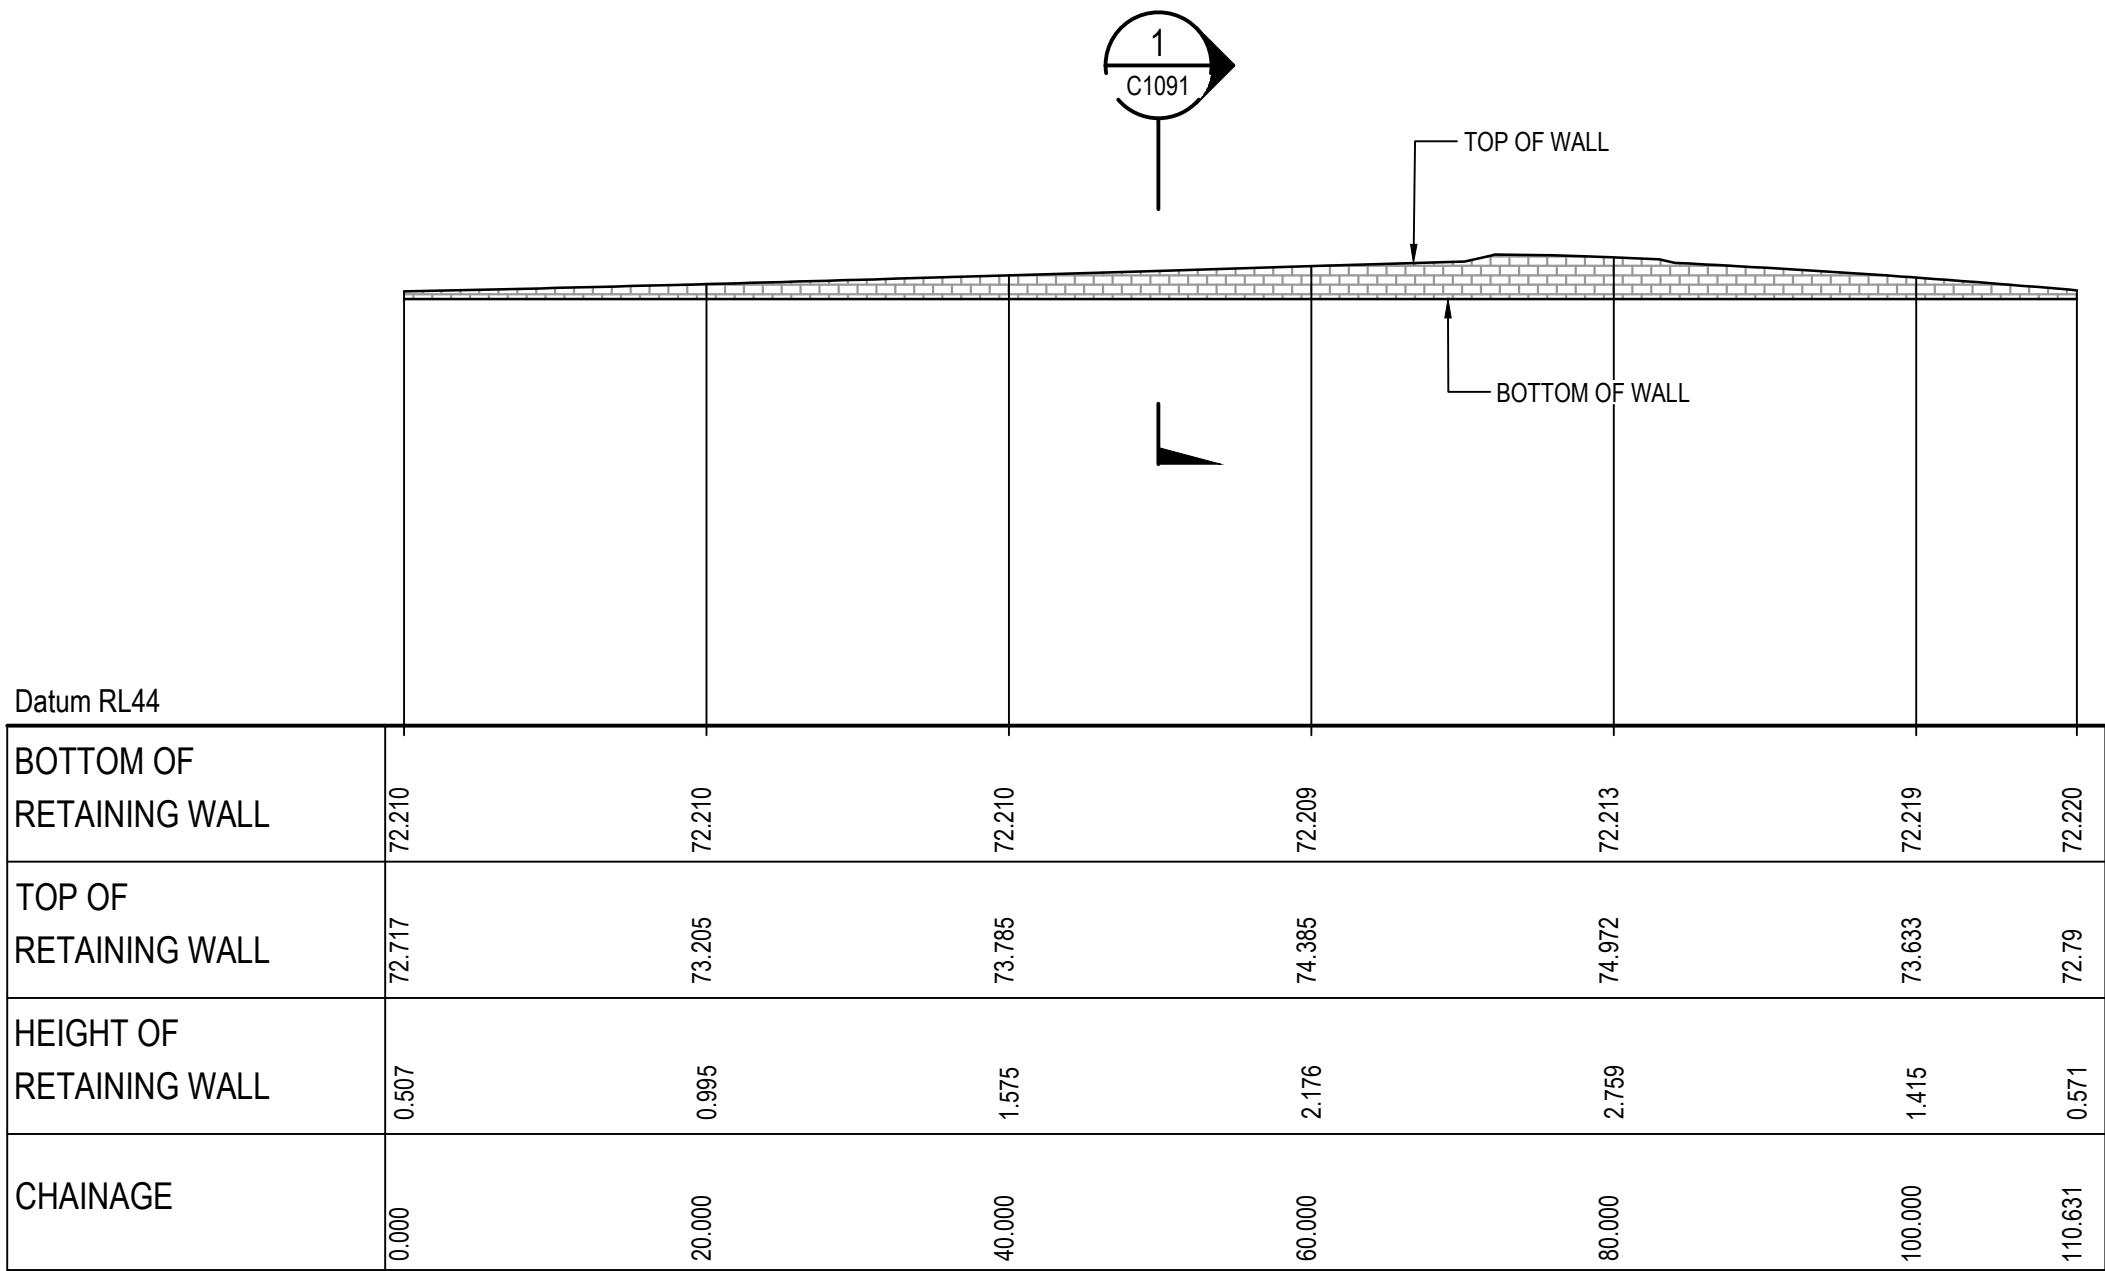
C1093	Project No. 19-609	Issue E
